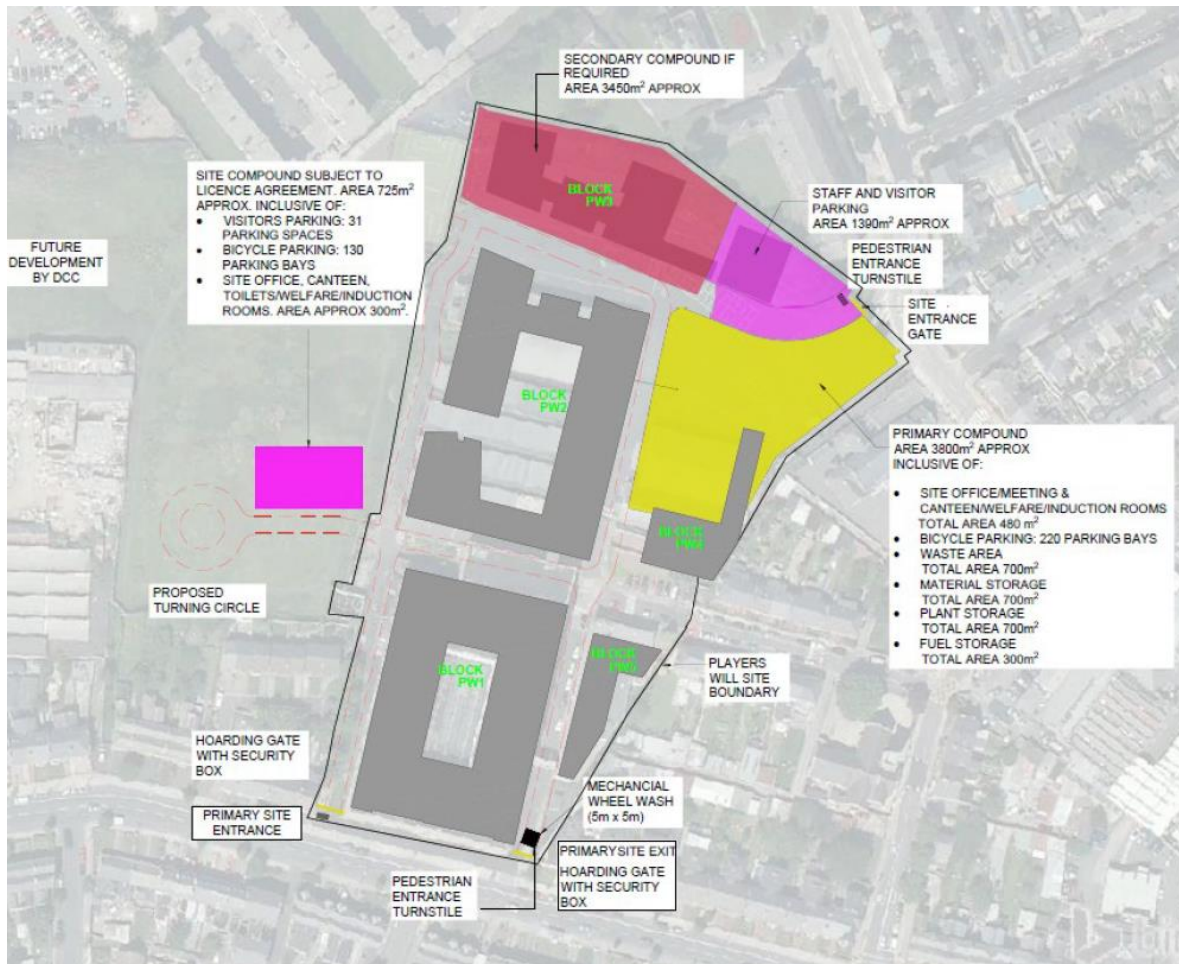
SITE CONSTRUCTION COMPOUND
